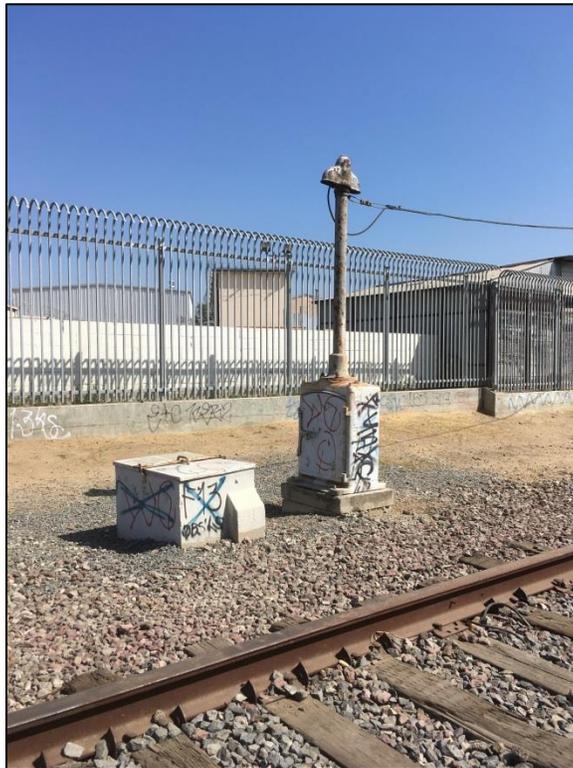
Overview of Harbor Subdivision rail near 4<sup>th</sup> Avenue.
